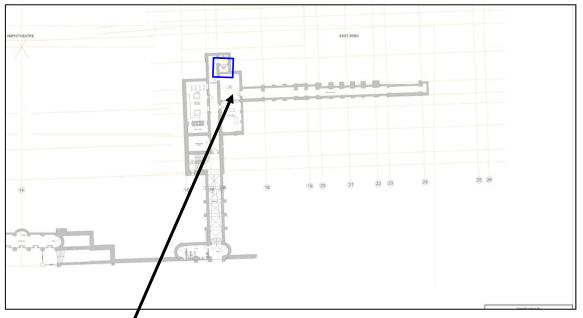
\_Union Buildings\_Overall Basement Floor Plan\_East Wing\_Location of existing Lift and location of water pump with outlet to courtyard (Source: Drawing Ikemeleng Architects, 2017)
